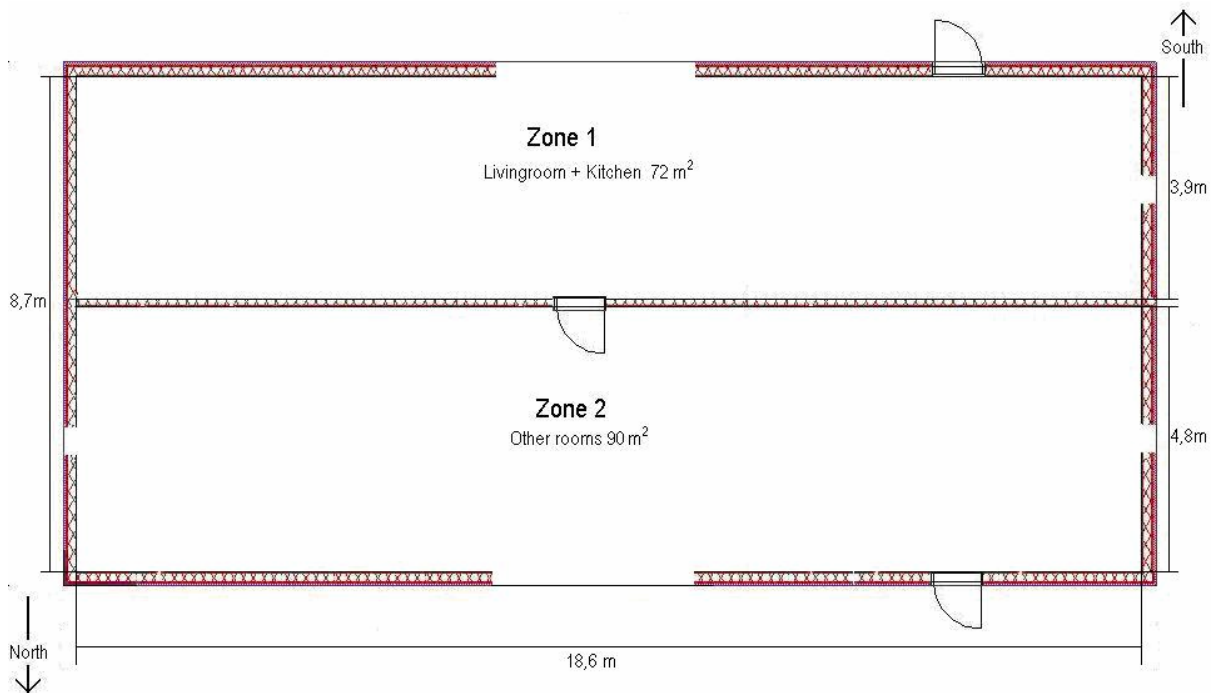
Case 1, a two-zone building having a separating wall in east-west direction.
